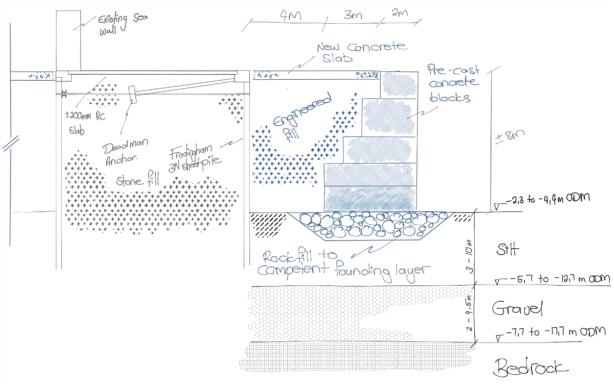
Sketch of Pre-cast Modular Concrete Block Gravity Wall
